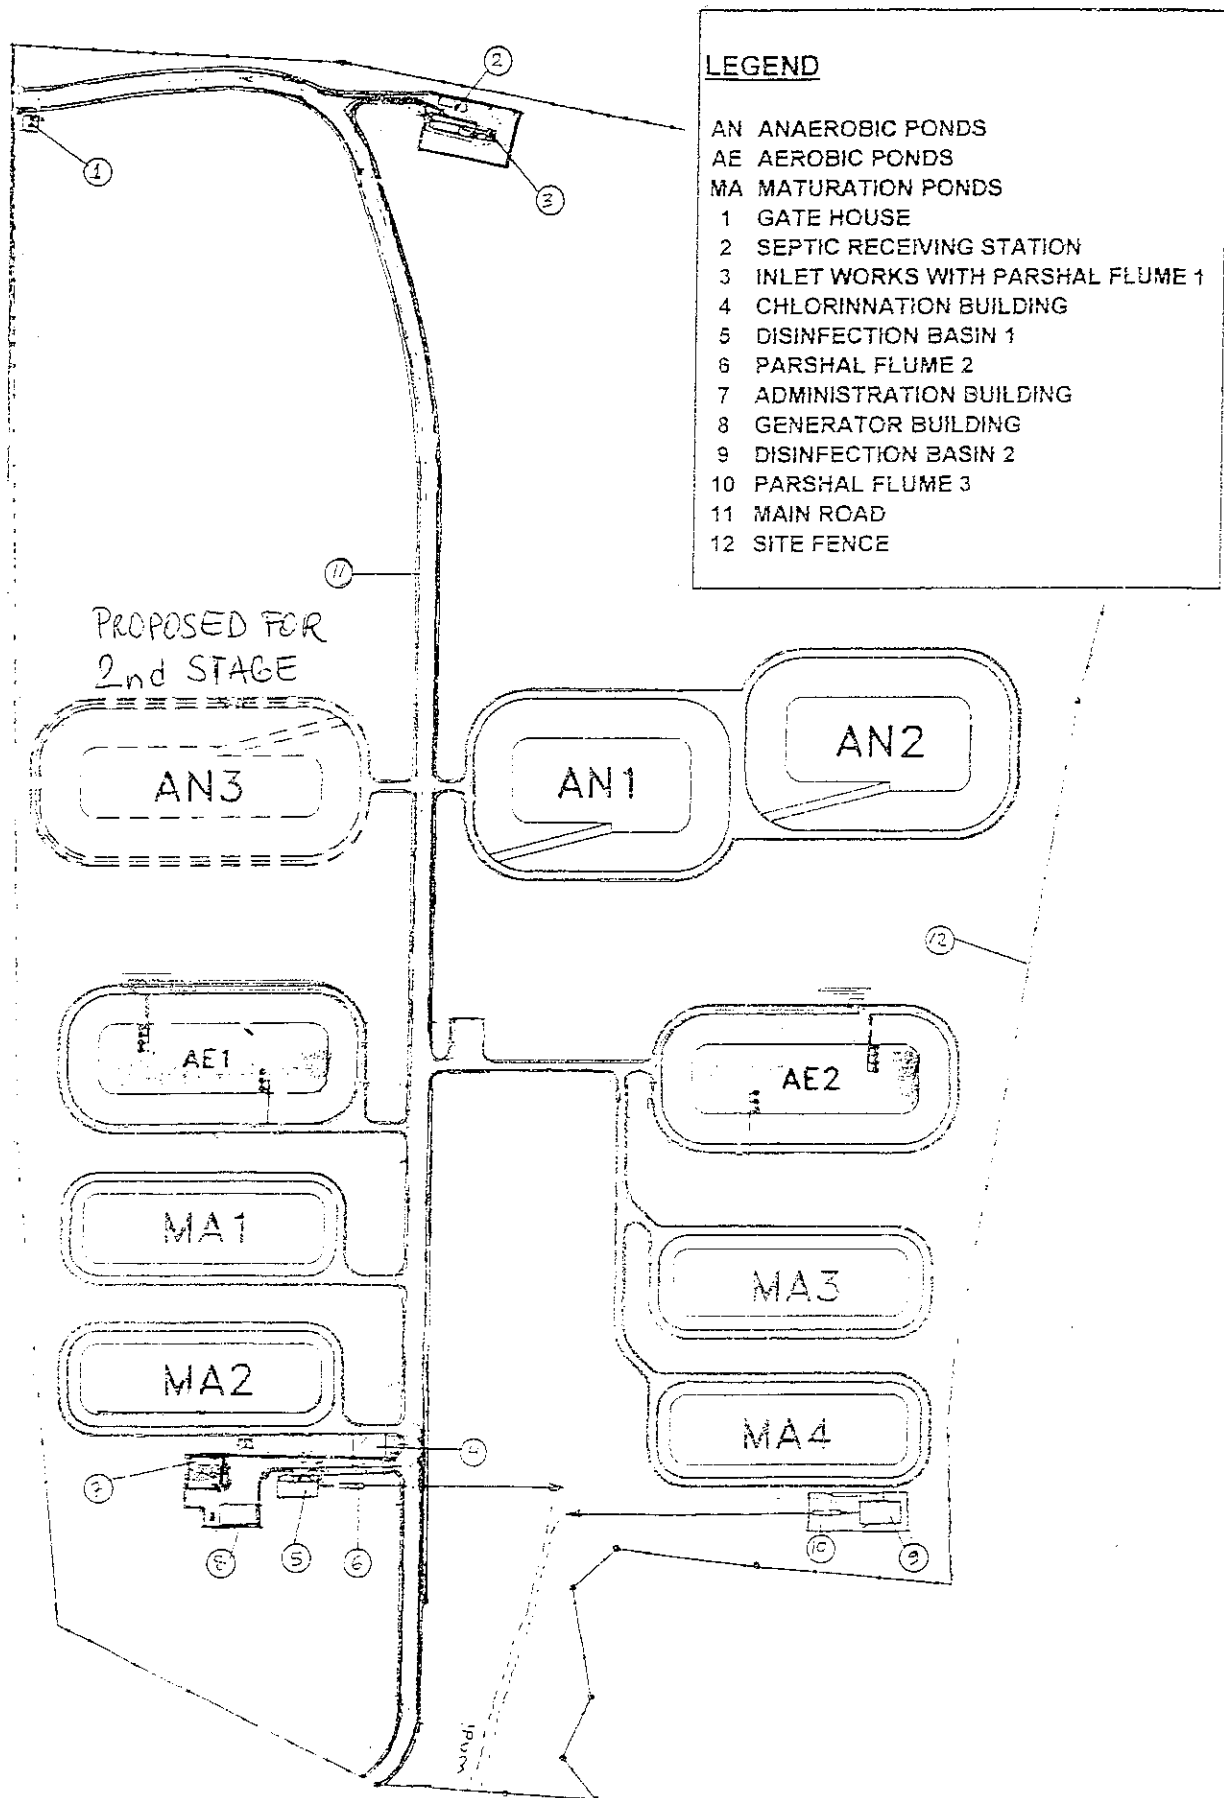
Schematic Layout of Existing Wastewater Treatment Plant - WADI ESSIR
